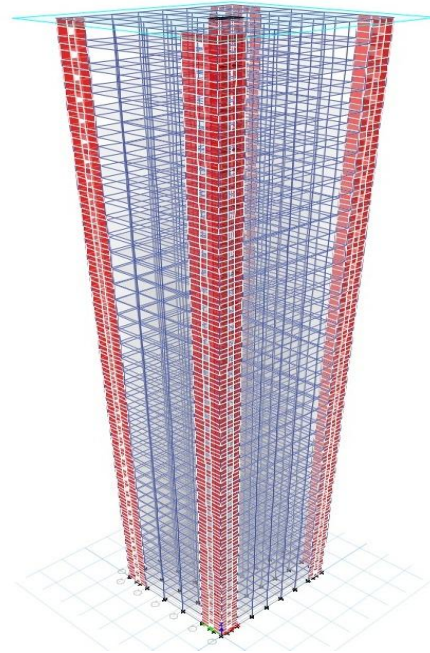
3D view with openings in corner(L shaped) shear walls
